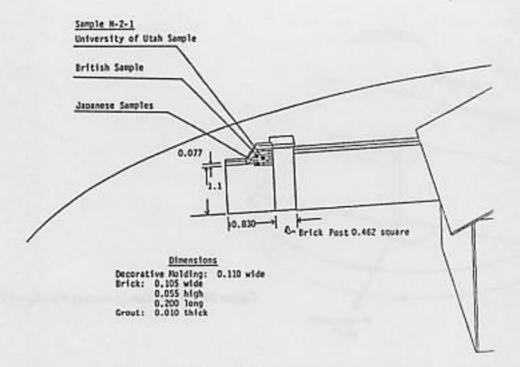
Ieno Wall and shed (detail). Dimensions in meters
